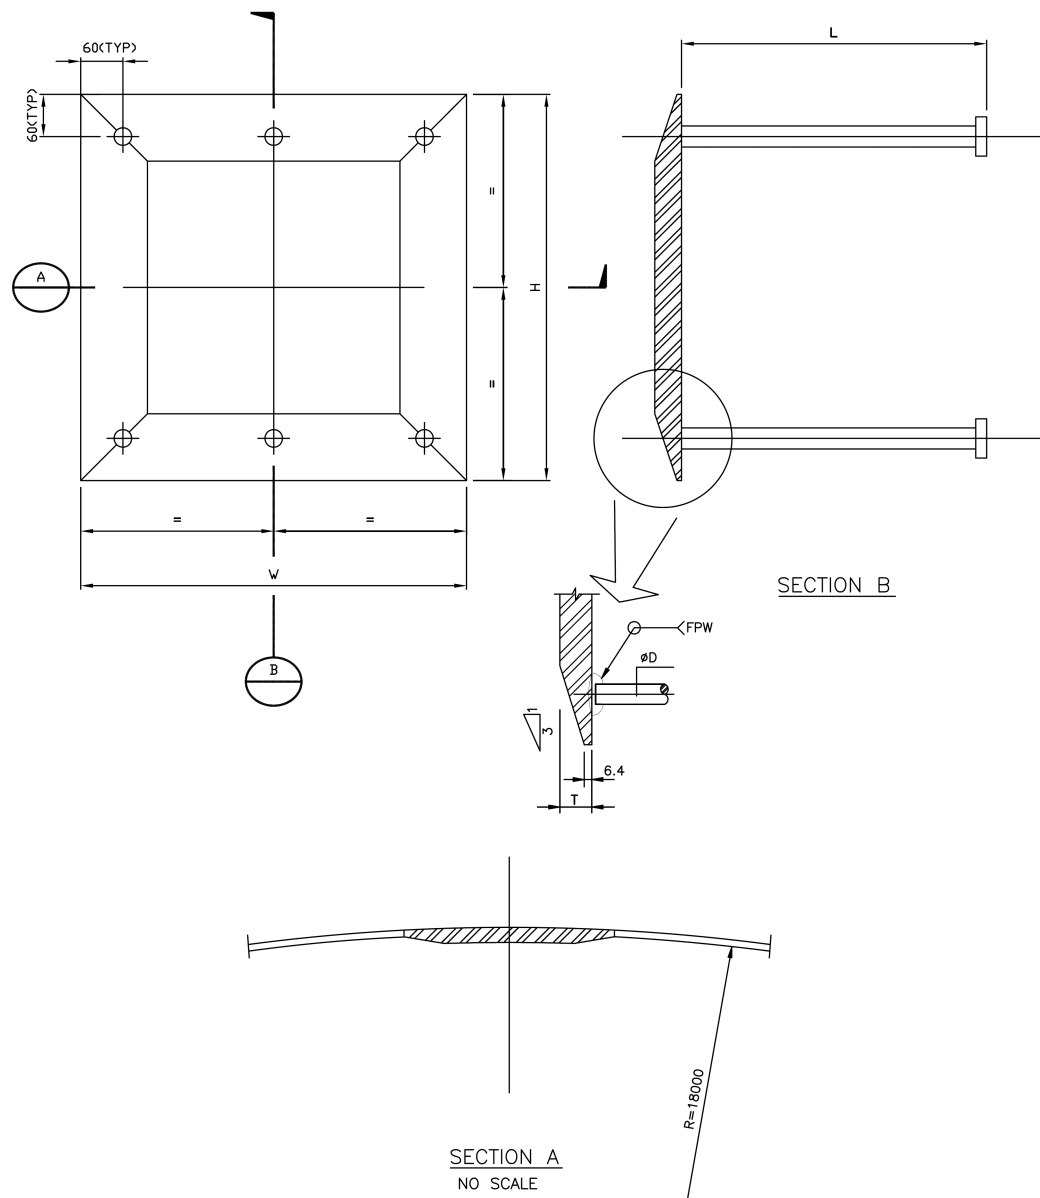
Typical Internal Containment Plate Support with Embedment Integral with Containment Liner
